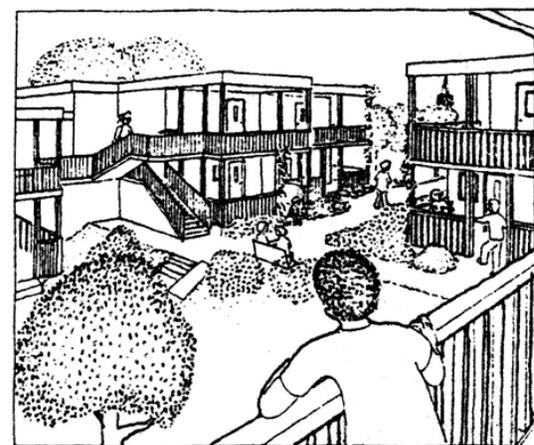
Outdoor areas from residences like yards, terraces and balconies that overlook common outdoor space make the space more enjoyable.
